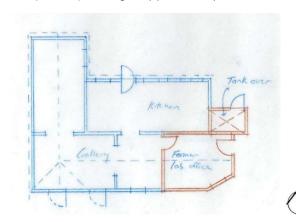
Mount Omei's former laboratory/ gallery floorplan sketched by Geoff Ashley (2016, p28) (no. '5' in site plan in Image 1.1).
